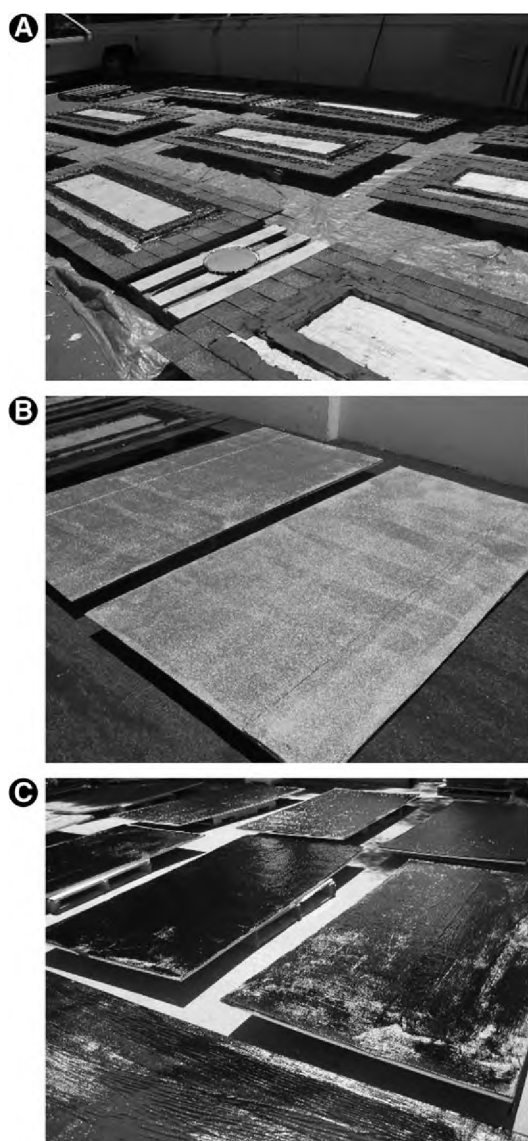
Typical examples of the three constructed roof types: (A) composition asphalt shingle roofing (asphalt shingle), (B) modified bitumen roofing (composite roofing) and (C) BUR.
